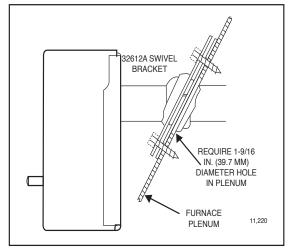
Swivel mounting requires a 1-9/16 in. (39.7 mm) diameter mounting hole for element insertion.
